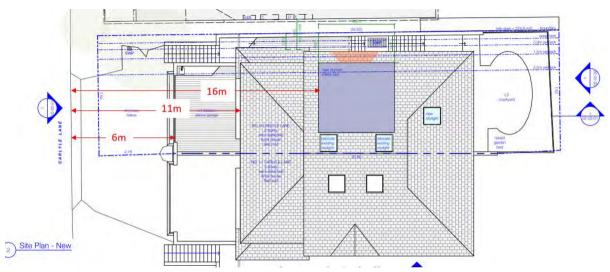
Annotated Site Plan (Dwg No. 02-01-01 Rev A) detailing the setbacks of the dormer and principal elevations to Carlyle Lane
